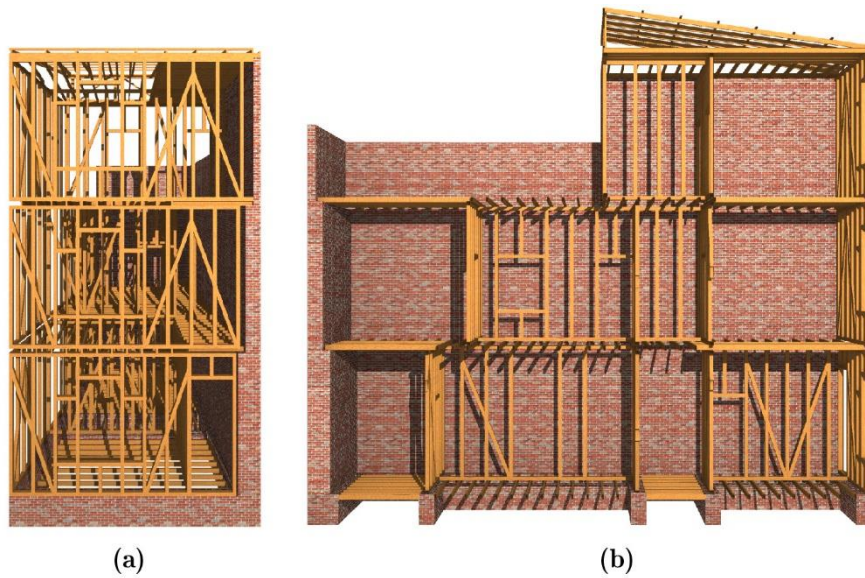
Structural configuration of Building 1: (a) frontal and (b) transversal section views.
